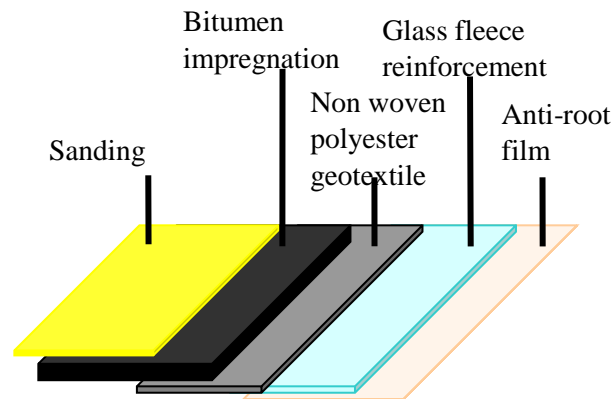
Typical cross-section of a BGM (adapted from Breul et al. 2008)
